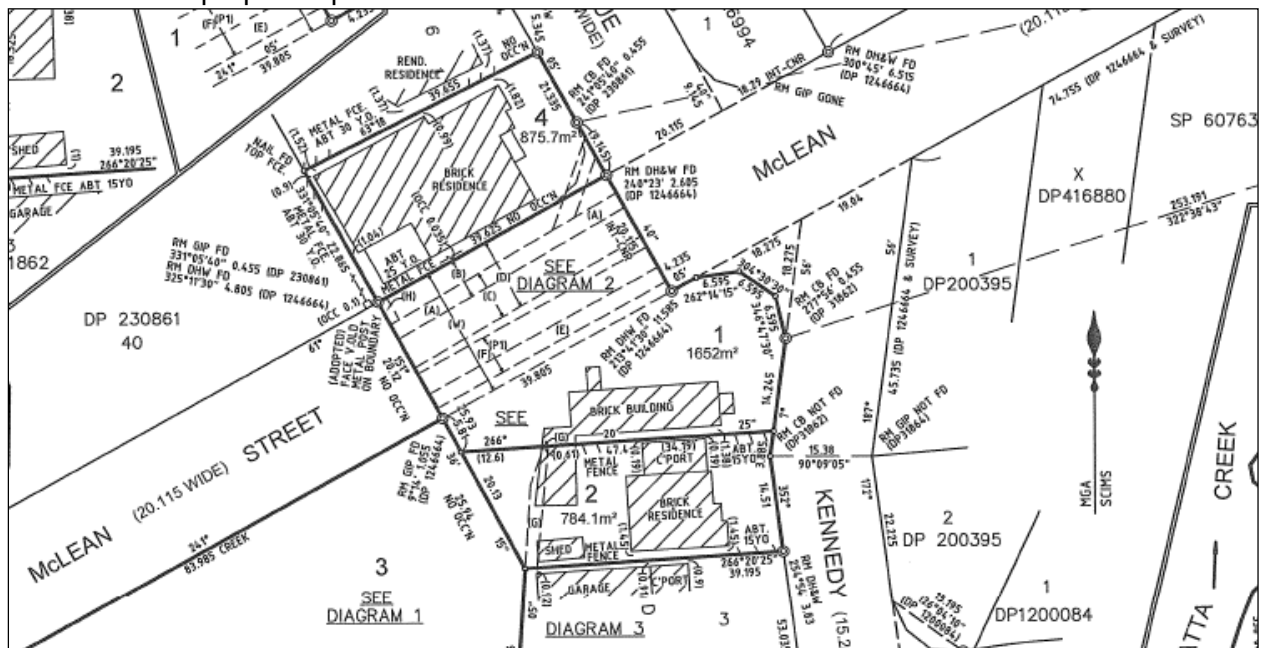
Proposed Boundary adjustment and re-subdivision of land.
